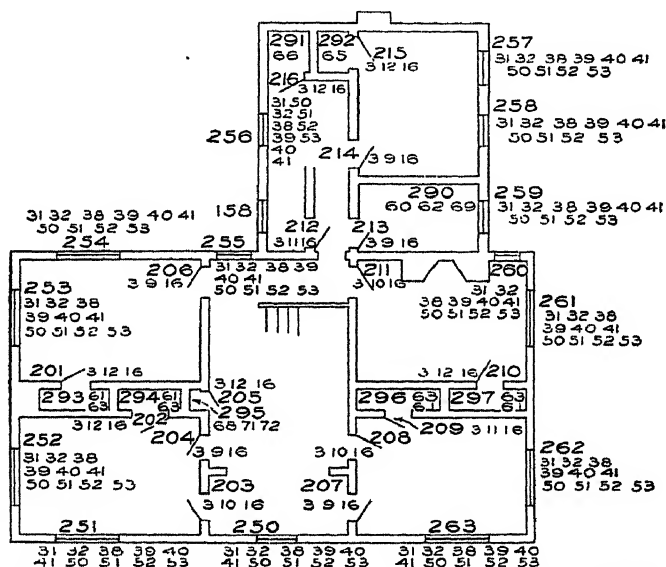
Second-Floor Plan, with Hardware Items Indicated.
